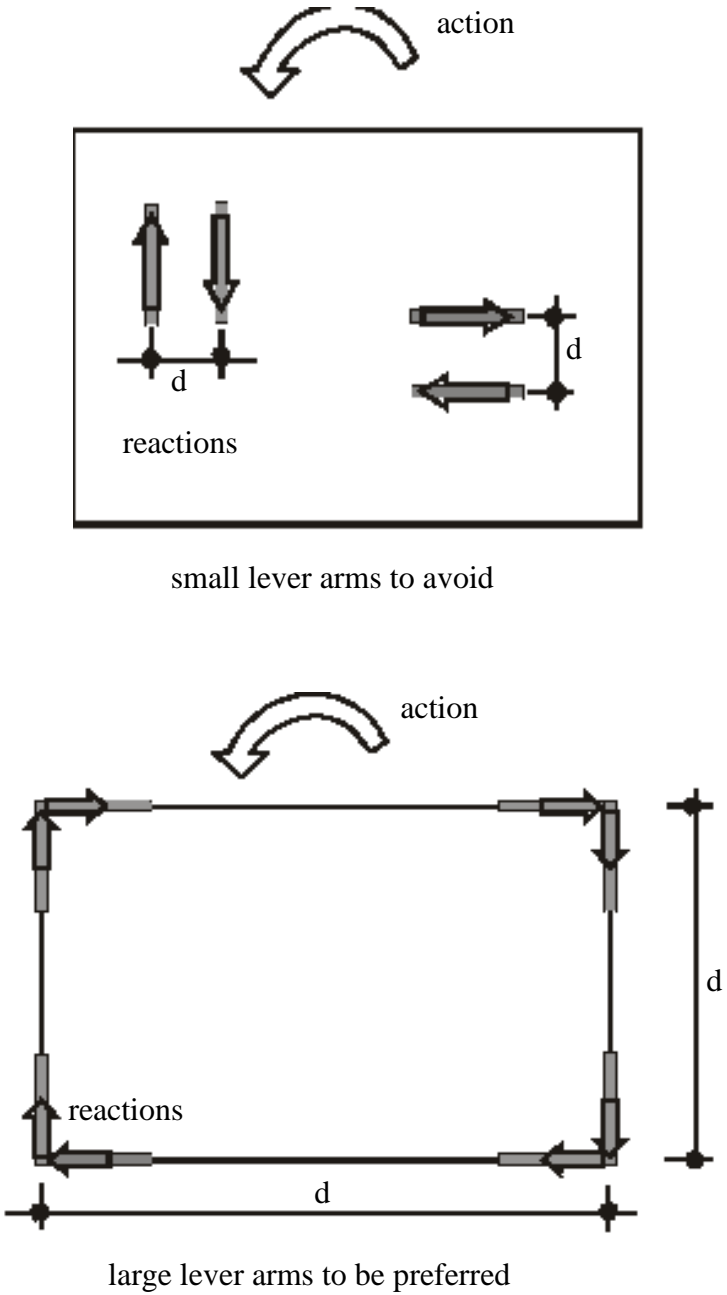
Good behavior of a building in nayou (primary structure) and peripheral structure (secondary structure). (Boumerdes, 2003)
